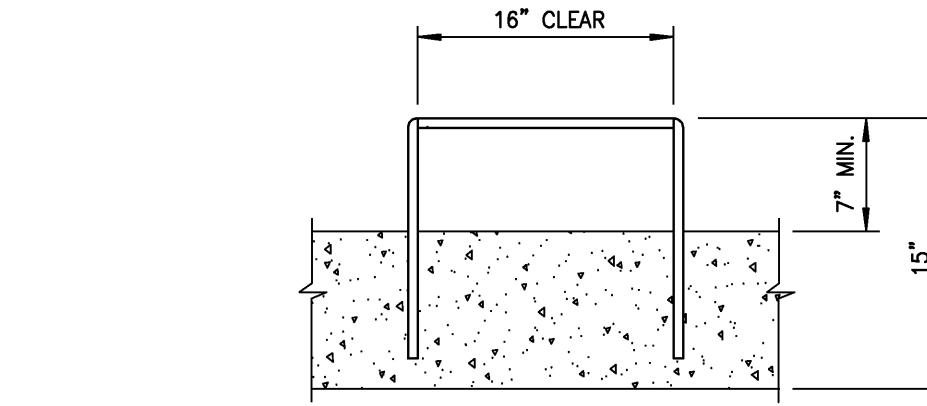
DETAIL - OUTLET STRUCTURE FOR OVERFLOW DRAINLINE
